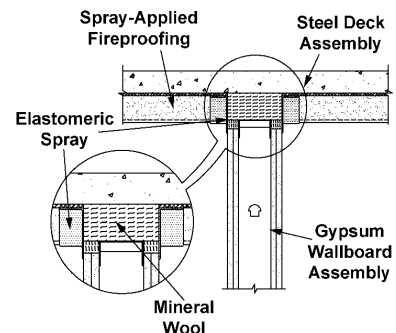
HEAD-OF-WALL JOINTS BETWEEN WALLS AND FIREPROOFED STEEL DECKS
